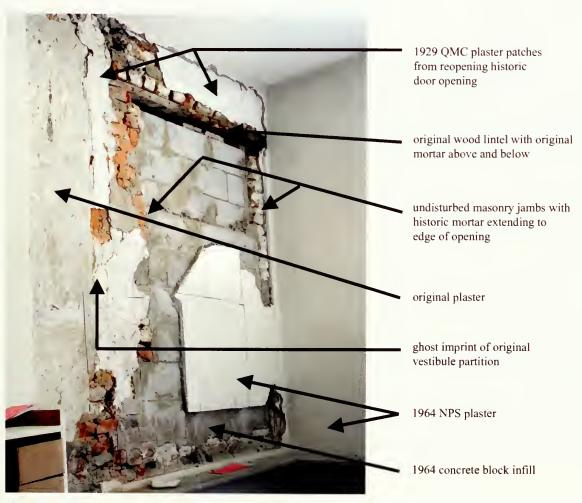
Center room, south corner of east wall, 2003. Showing the original doorway to the east room upper-level. This opening and the corresponding opening on the west wall were filled in by the QMC after the Civil War, when the adjacent room were converted to a single story space. The QMC reestablished the openings in 1929 as part of their restoration. The National Park Service closed them up again in 1964 when they reverted to single story spaces in the end rooms.
